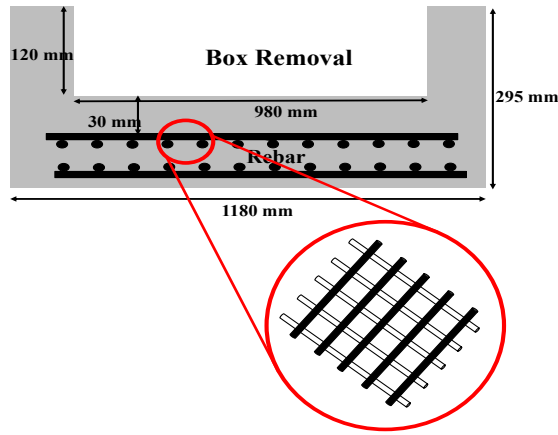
Schematic diagram of Precast Rebar Concrete.
